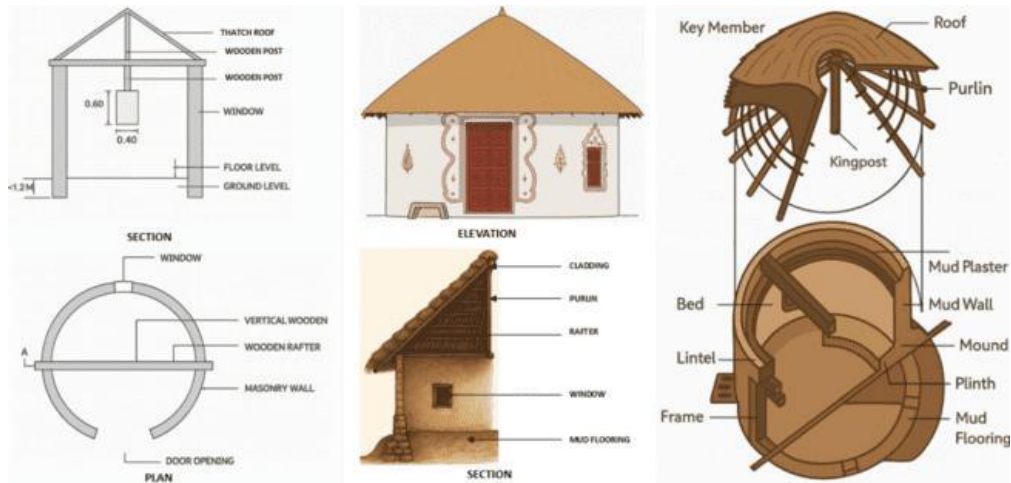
Architectural details of Bhunga houses in Kutch, Gujarat, showing plan, sections, and elevations.
